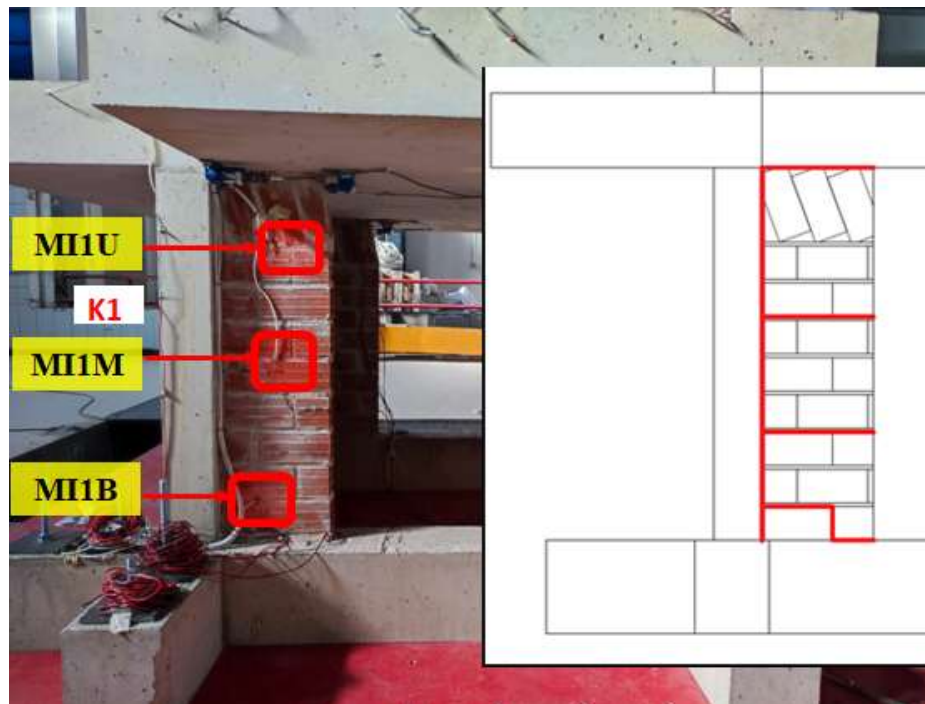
Observed damage after 1.1g test and location of PZT sensors on full Infill wall between columns 1-4
